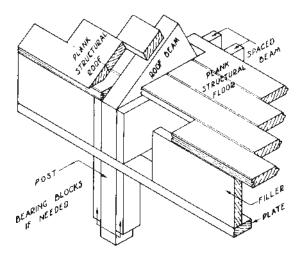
Arrangement of Roof and Floor Beams to Absorb Horizontal Thrust
